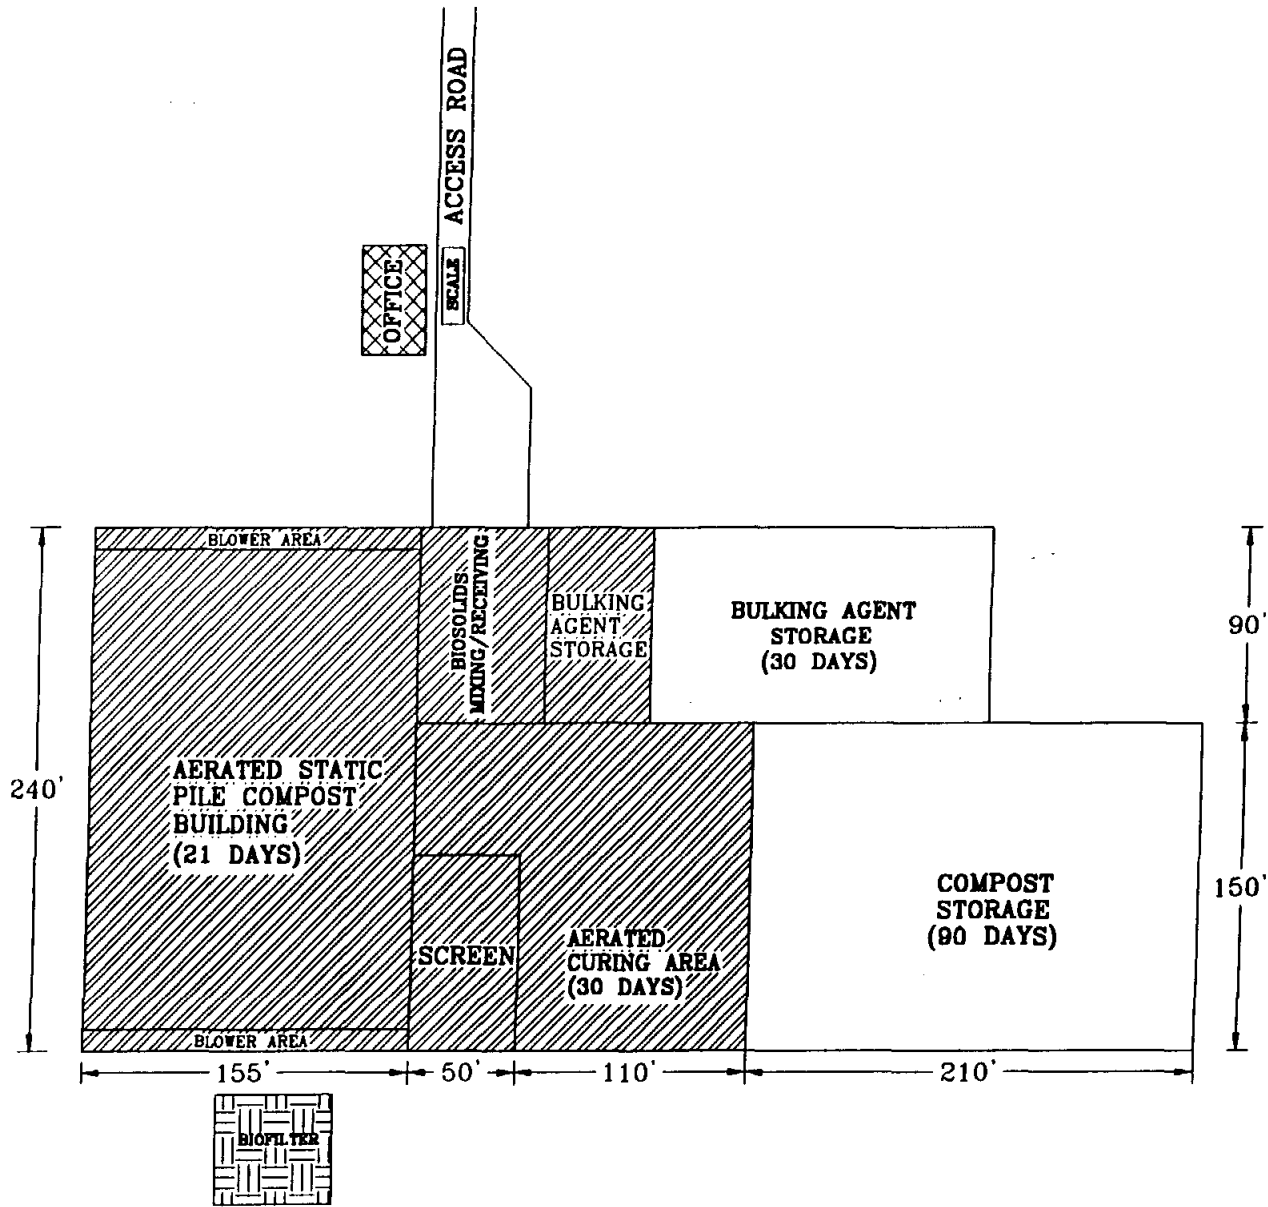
FACILITY LAYOUT - AERATED STATIC PILE 15 DTPD
